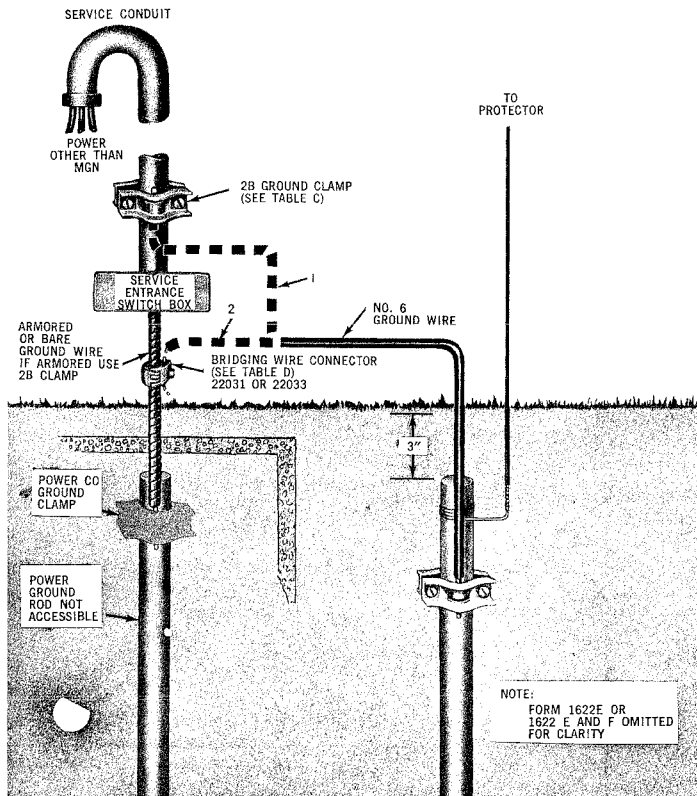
Power Other Than MGN Grounded to Inaccessible Ground Rod
